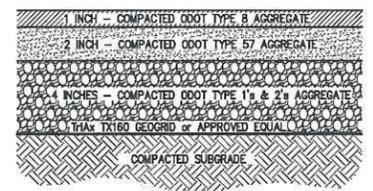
DETAILED SITE PLAN FOR STANARD WELDING & STEEL PRODUCTS, INC.
